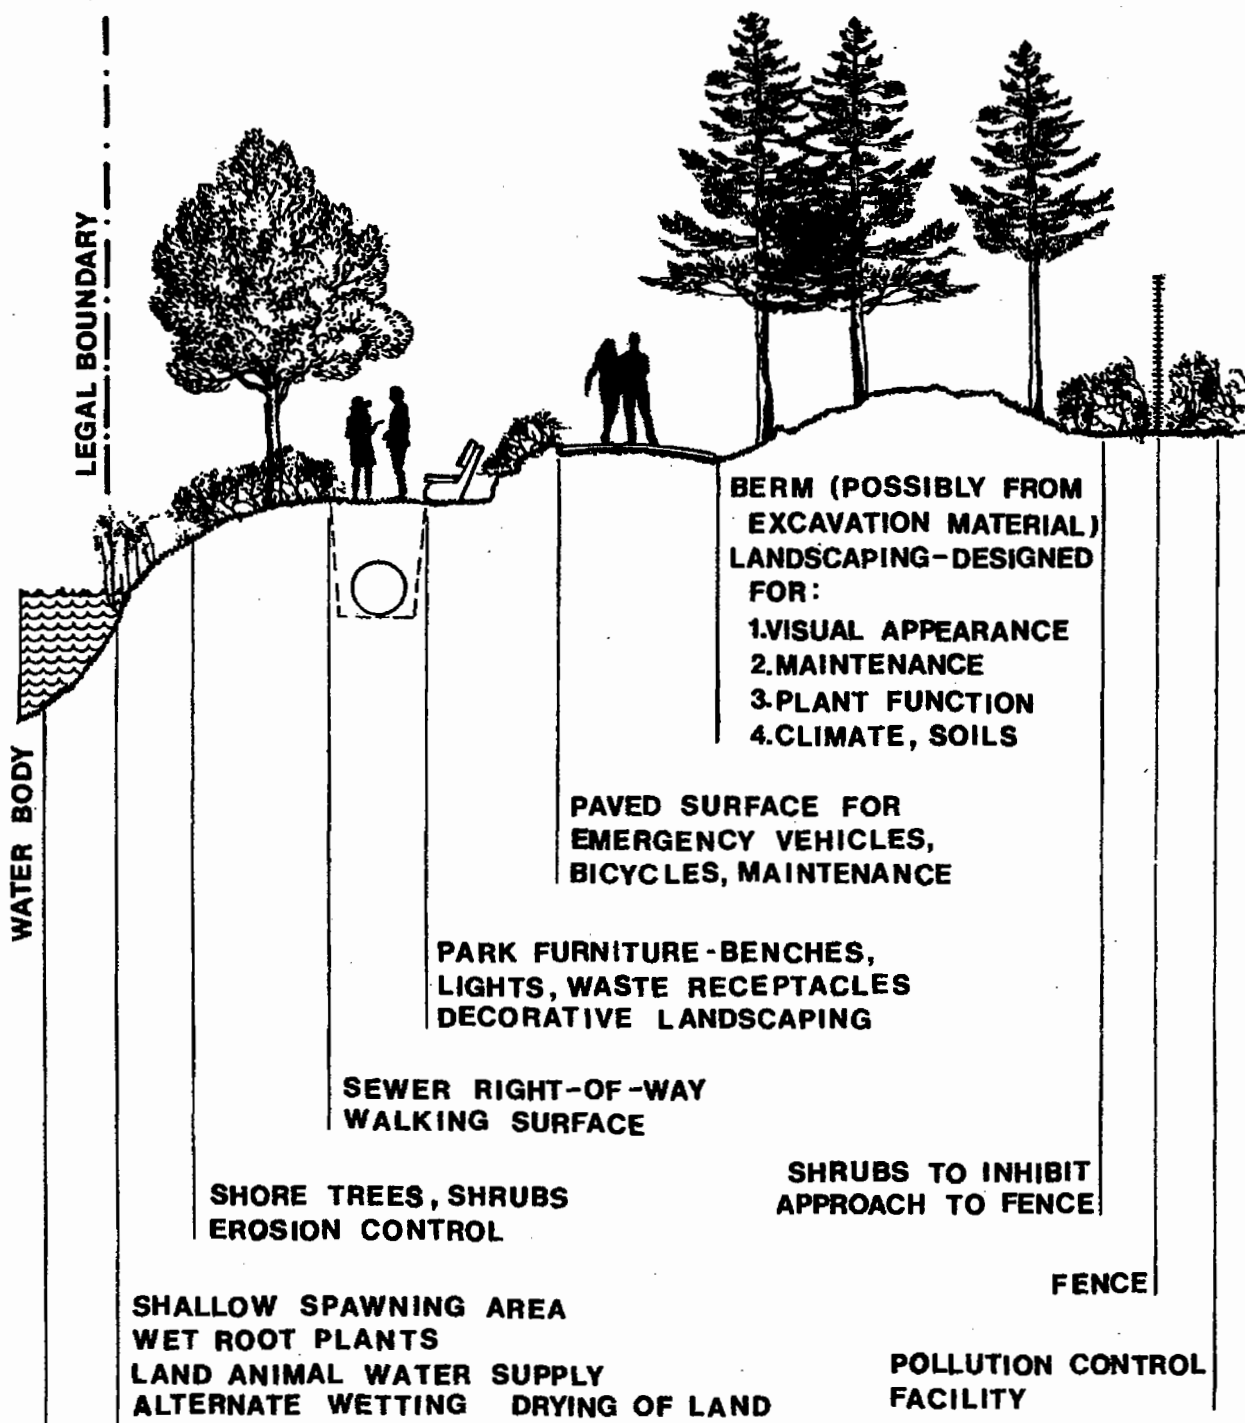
Wastewater Treatment Plant Site, Shoreline Planning (from Ref. 2).
